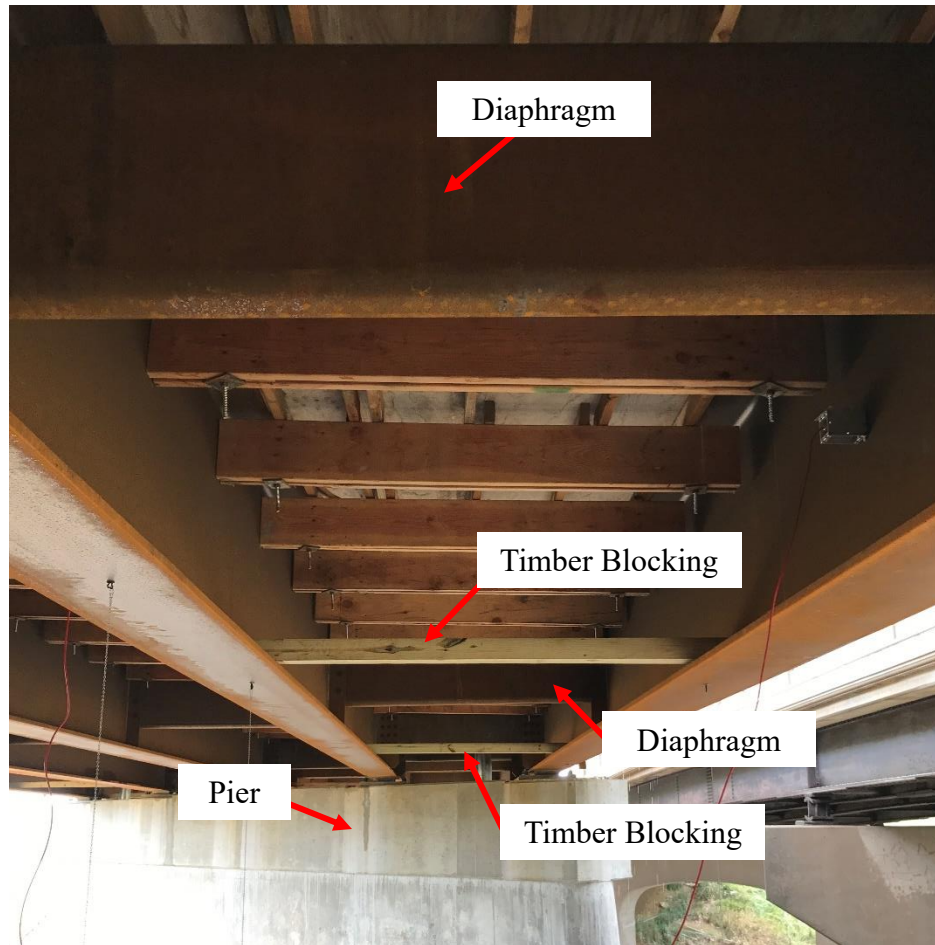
Temporary timber blocking locations in the exterior bays of the BNSF Railway Bridge
